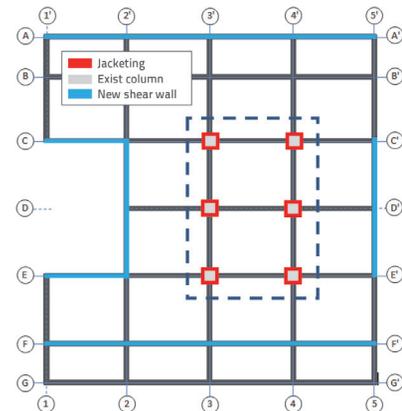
E-1 block basement floor plan: strengthened columns and new shear walls
